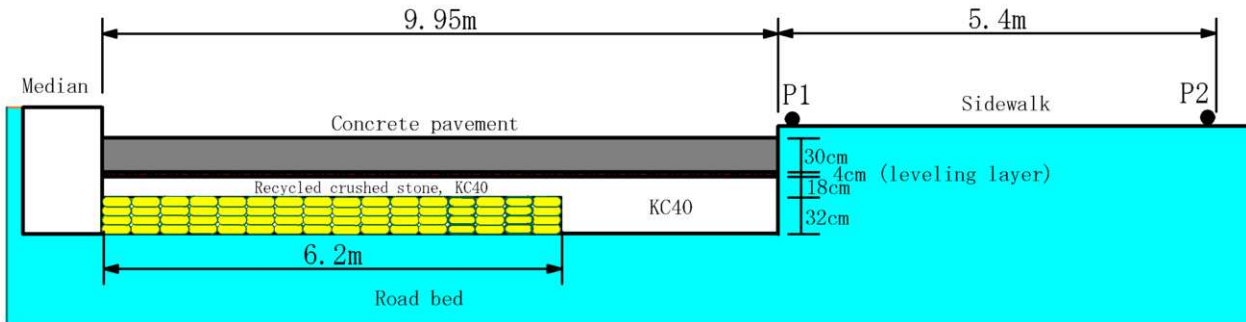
Schematic view of reinforcing the truck road under concrete pavement with soilbags and the locations of the vibration measurement points.
